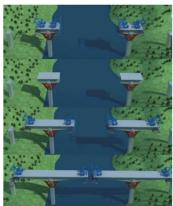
Balanced Cantilever Segment Approach
